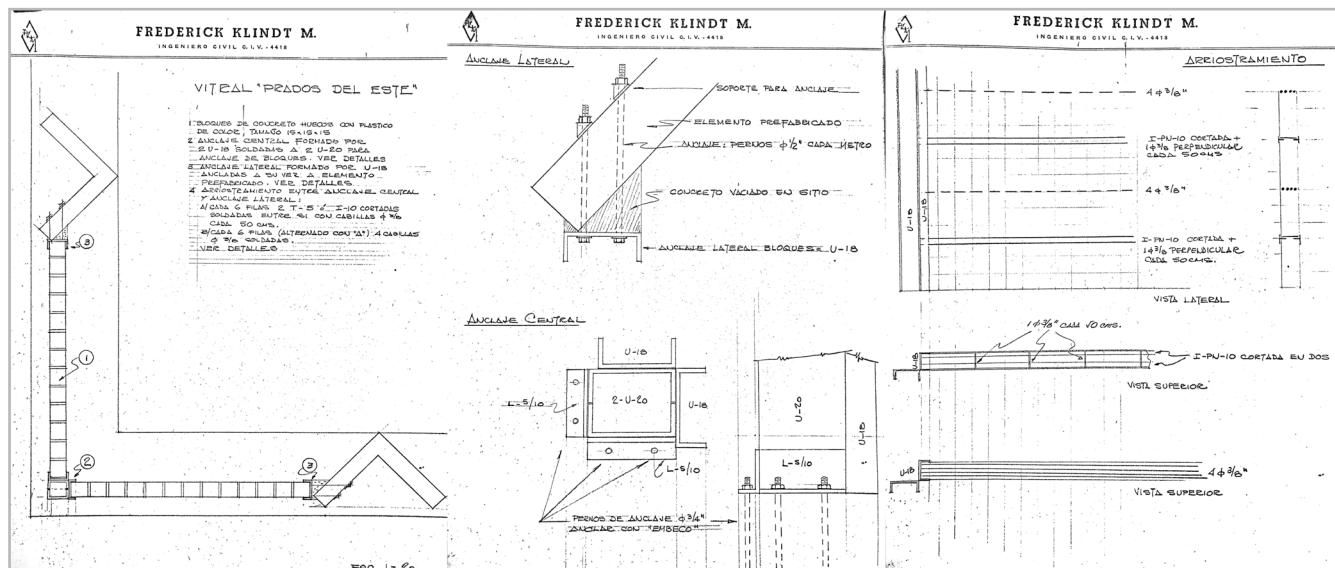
Archival drawings by Frederick Klindt Mantellini: (a) Plan View; (b) Anchor Details; (c) Elevation and Bracing Scheme
